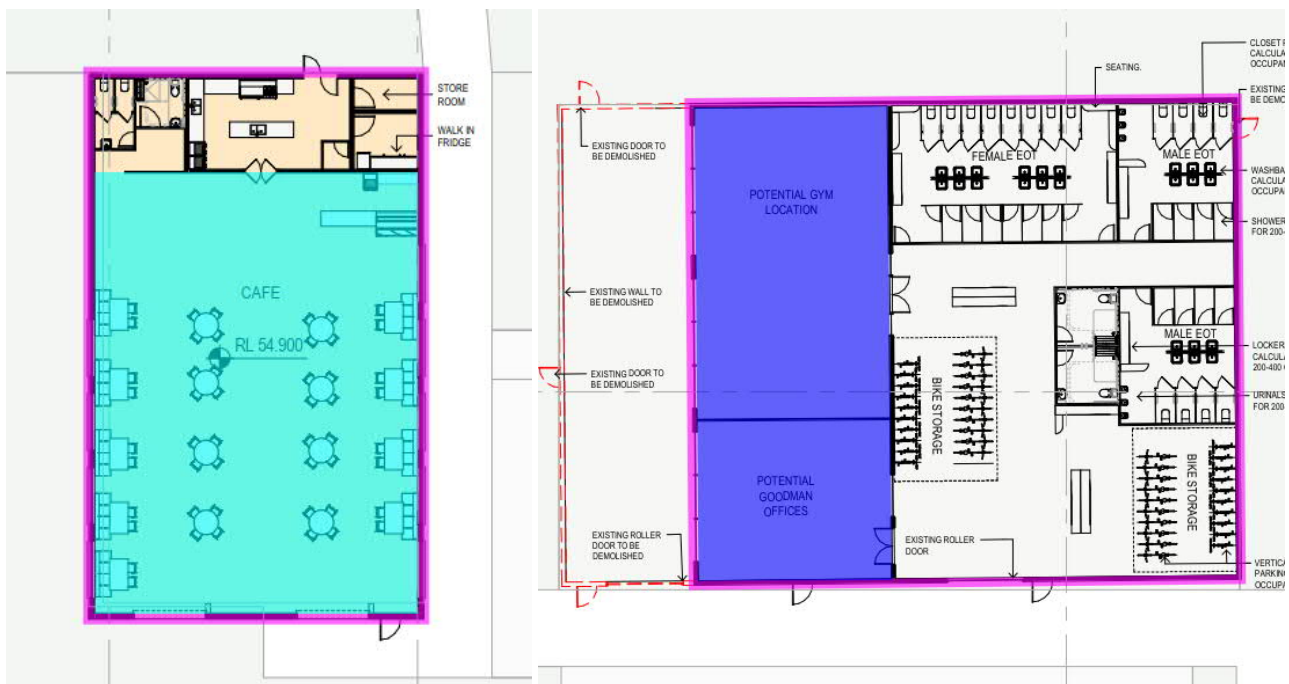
HVAC zones & thermal envelope for the Café (relocated Building 15) (Left) and Building 28 (Right)
